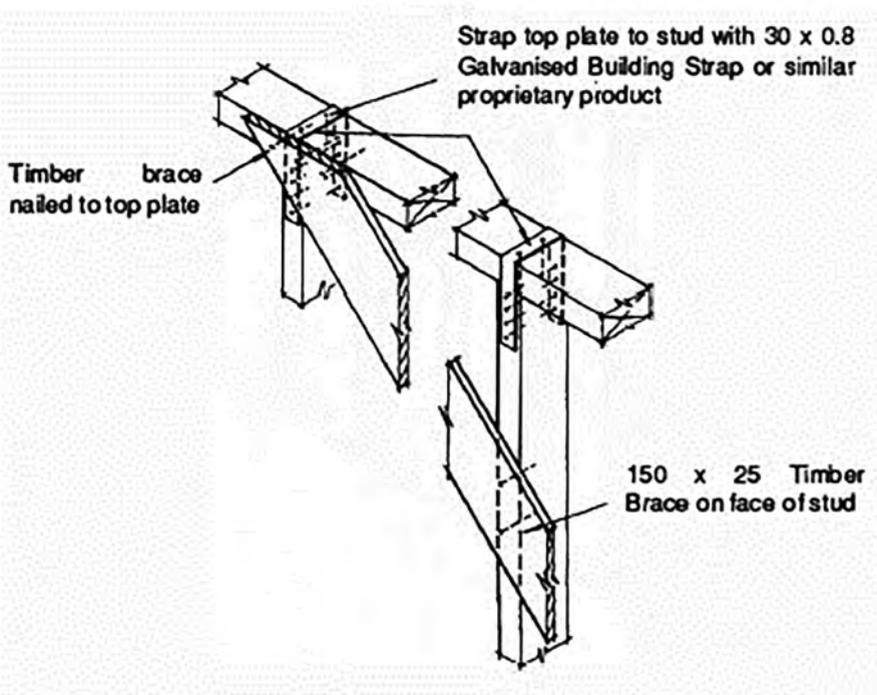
INTERNAL BRACED WALLS NOT SUPPORTING VERTICAL LOADS FROM ROOF OR FLOOR
